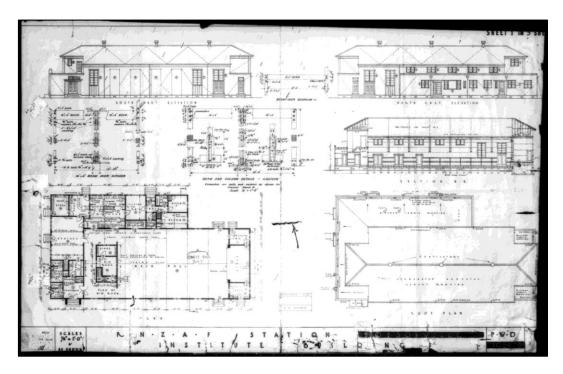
Plans for 'RNZAF Station Hobsonville Institute Building'. Includes floor plan, roof plan, elevations and a long section. Facsimile is difficult to read. Appears to be dated July 1939. The orientation of the building is incorrect for Hobsonville. The building also includes one extra bay. The drawings are thought to be for the Institute Building at the base at Wigram, ready for adaptation for the building at Hobsonville. Extracts from this are included below.
